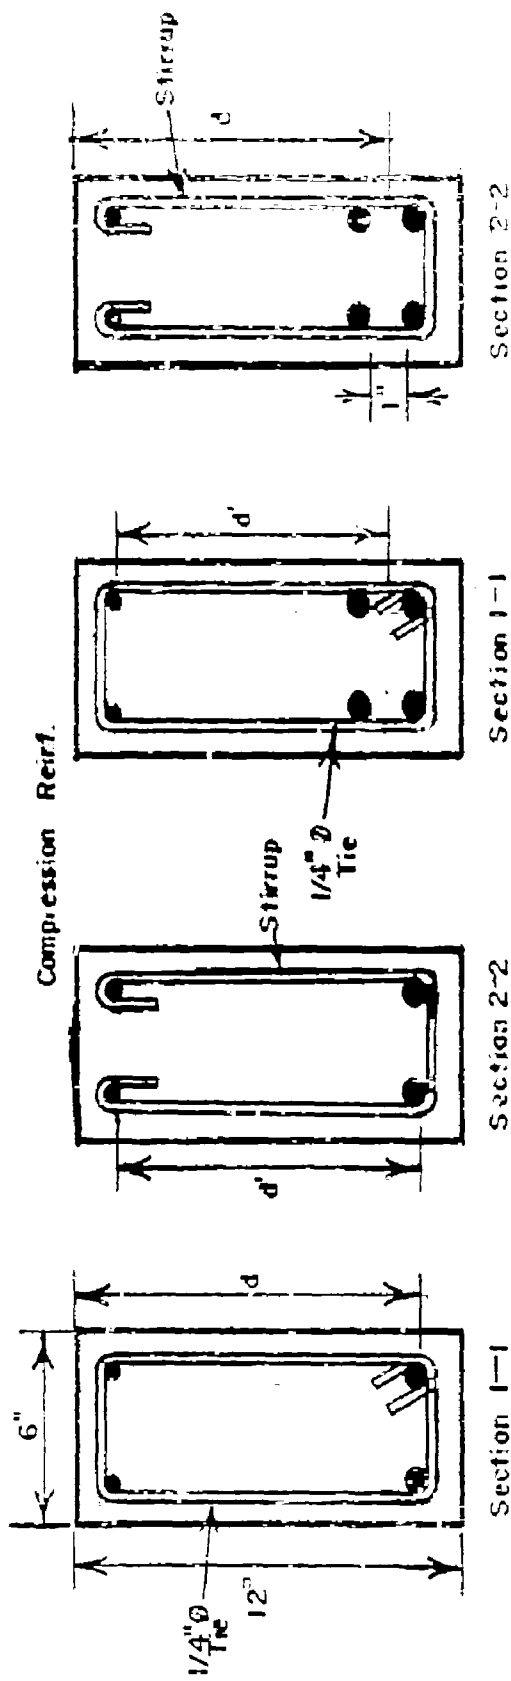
ARRANGEMENT OF REINFORCEMENT FOR
